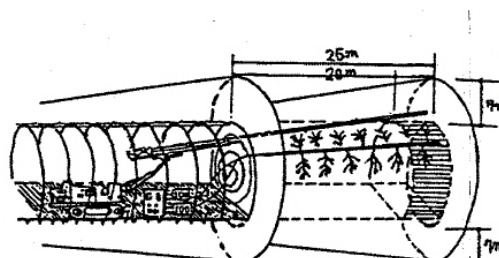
Rockbolt installation of Noksapyeong tunnel station
